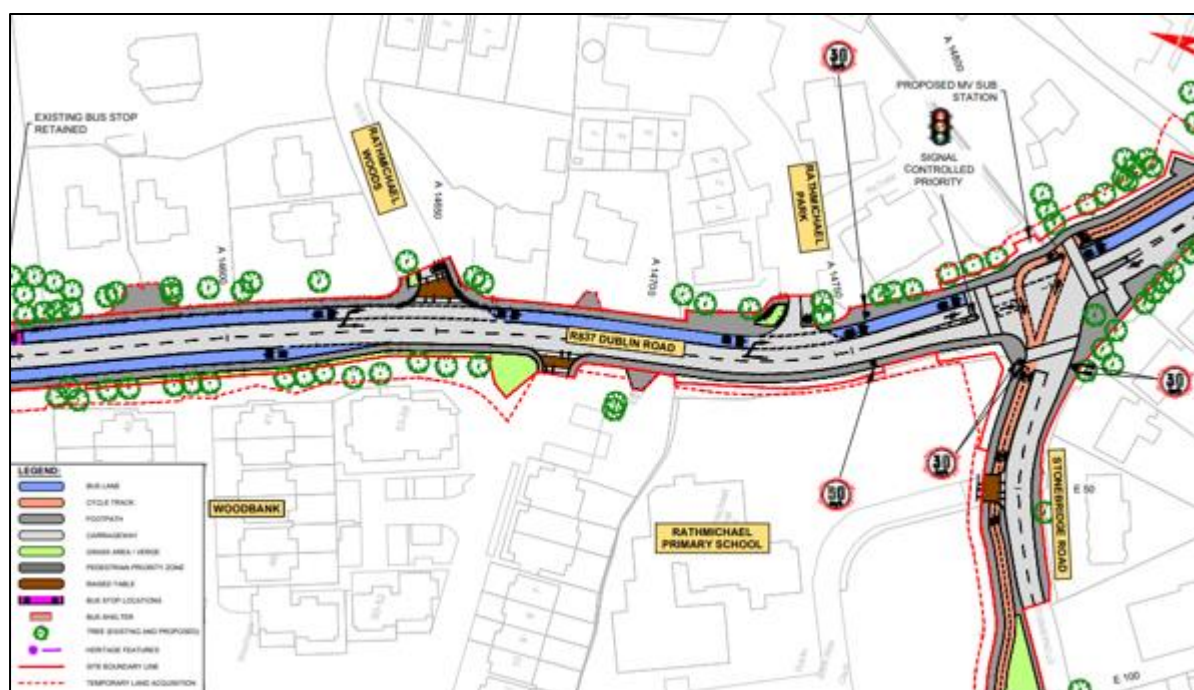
Extract from General Arrangement Drawings at Woodbank (Sheet 42)
